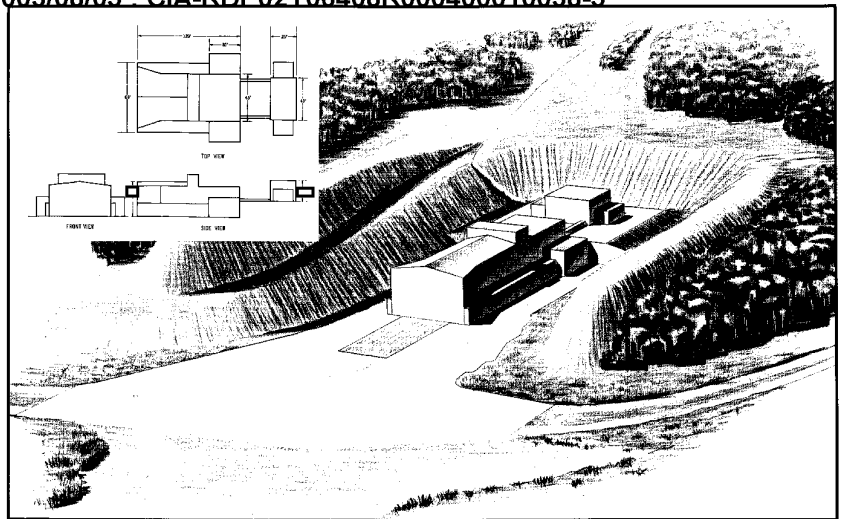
CONCEPT OF TEST CELL 2, TEST FACILITY No. 1
